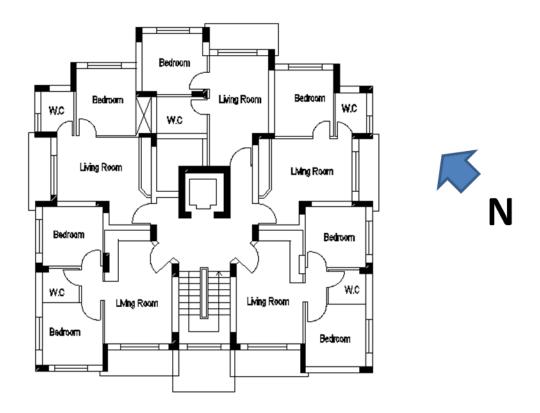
Typical Floor Plan of New Building, Hasan Hoca 3, (Author, 2013)
